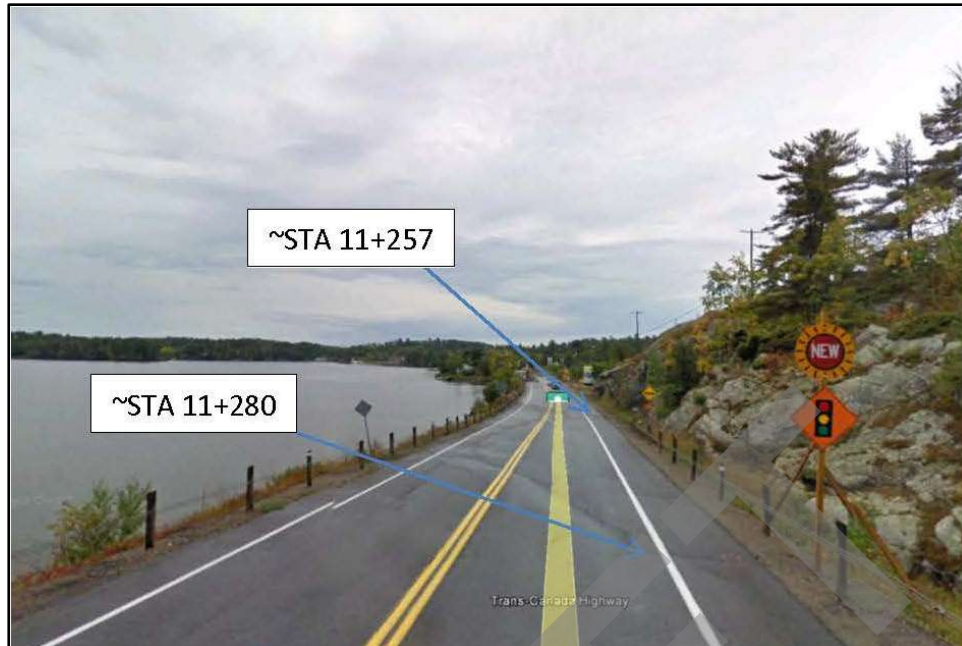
Embankment distress section looking south (courtesy of Google – 2009)
